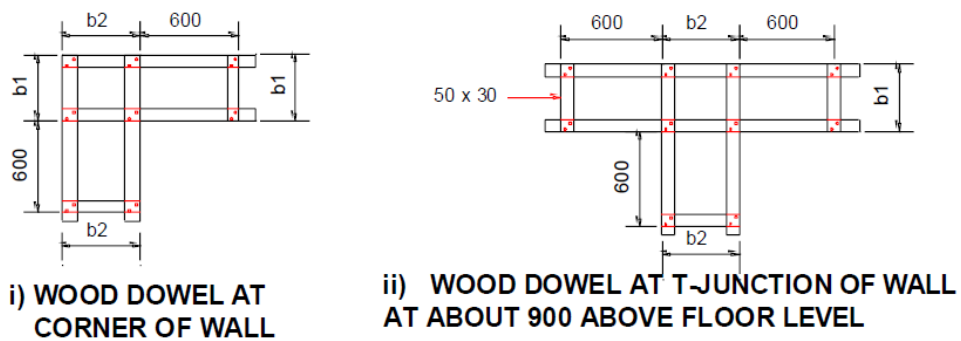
Details of Timber Reinforcing at Corners and T-Junction
